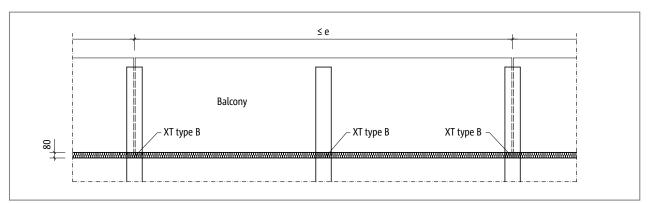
Schöck Isokorb® XT type B: Expansion joint arrangement
